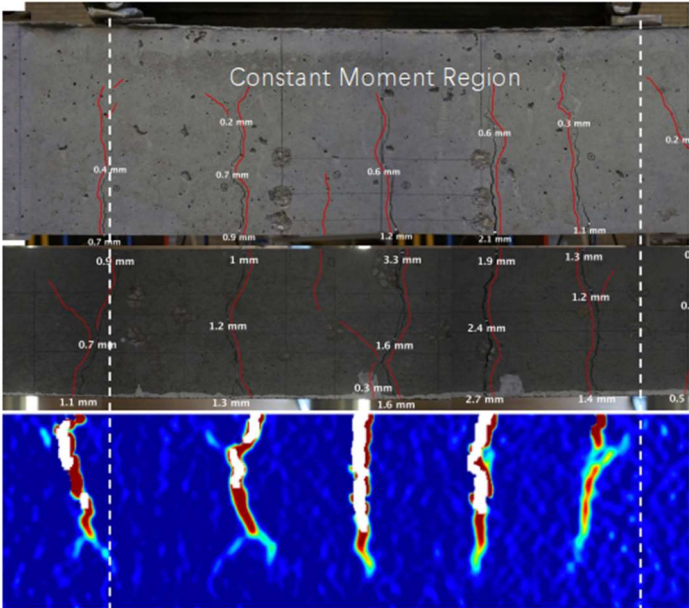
crack pattern of a traditionally reinforced concrete beam (Huang, 2017)
